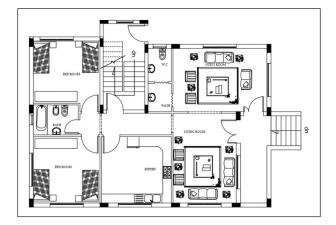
Typical House Plan (Mohammad Alrafai house) by author.
